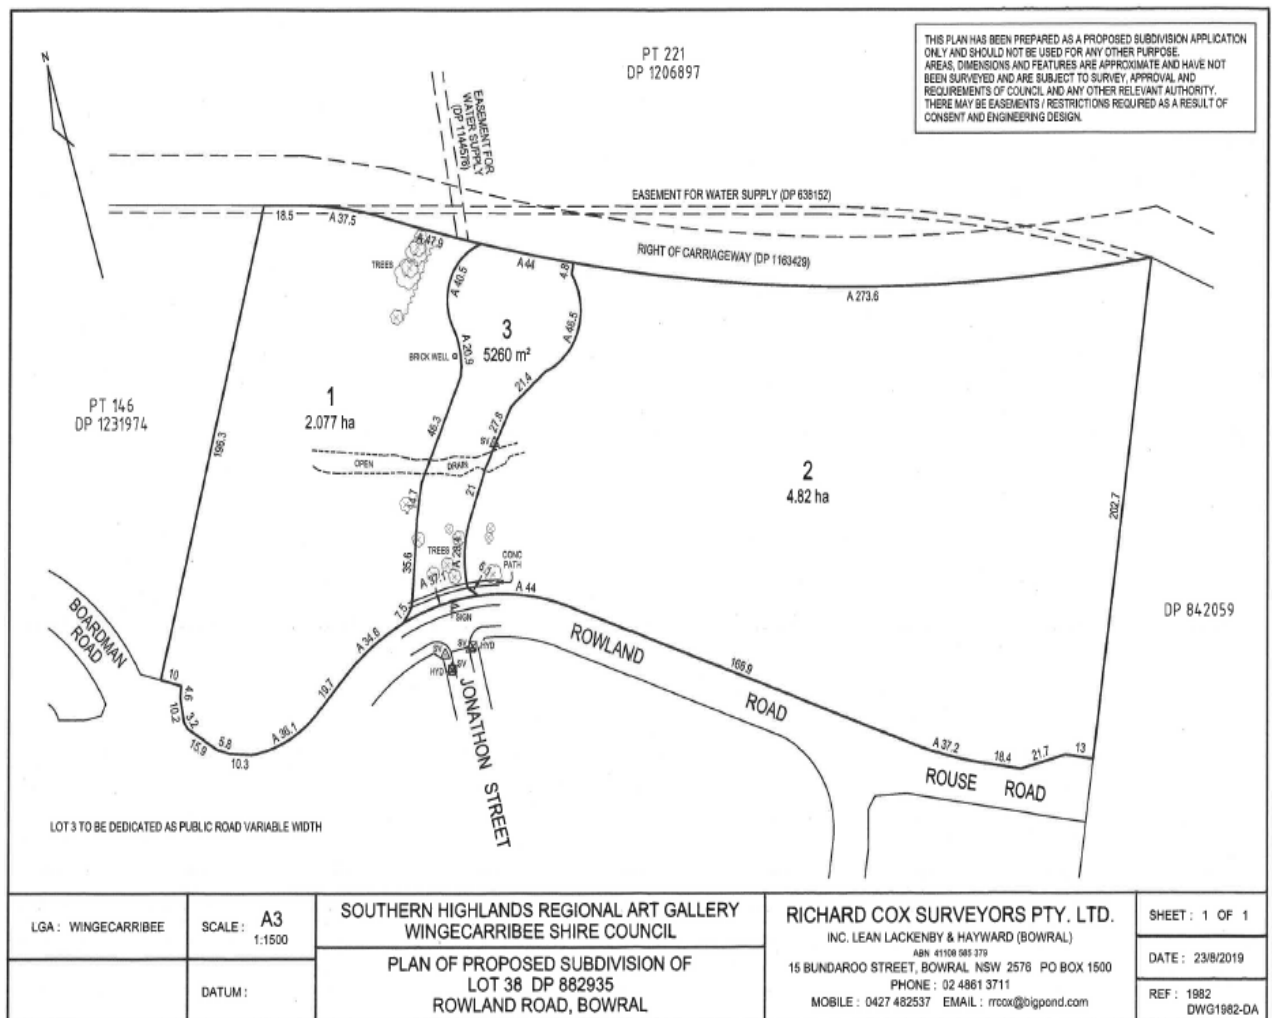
Plan of proposed subdivision (included as Attachment 3)
